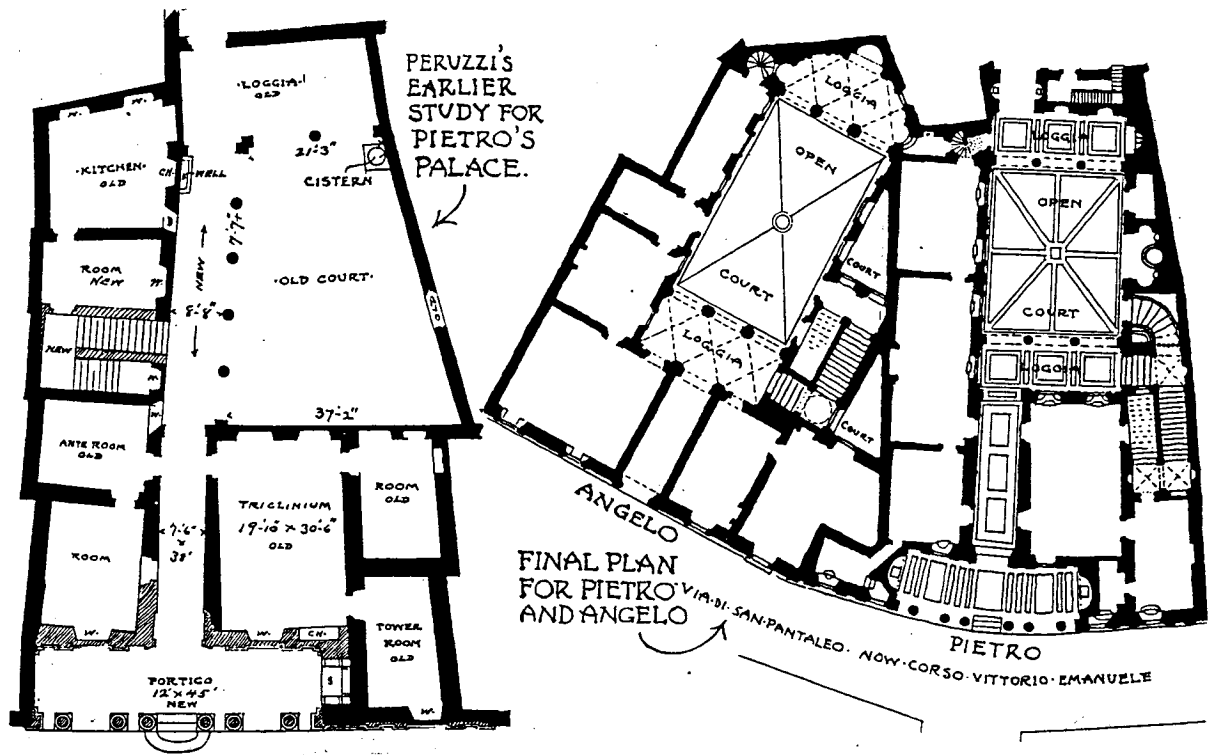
Palazzo Pietro Massimo: early study and final plan (from Kent)
